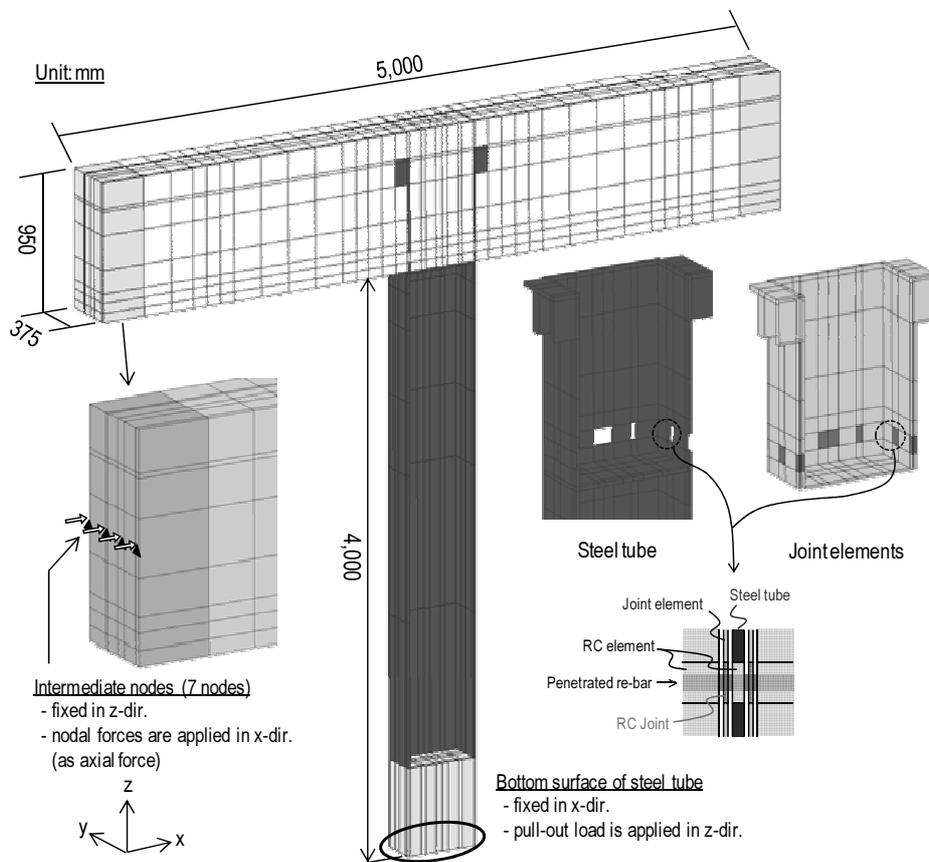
Finite element model used in the simulation of joint connection in the actual bridge
